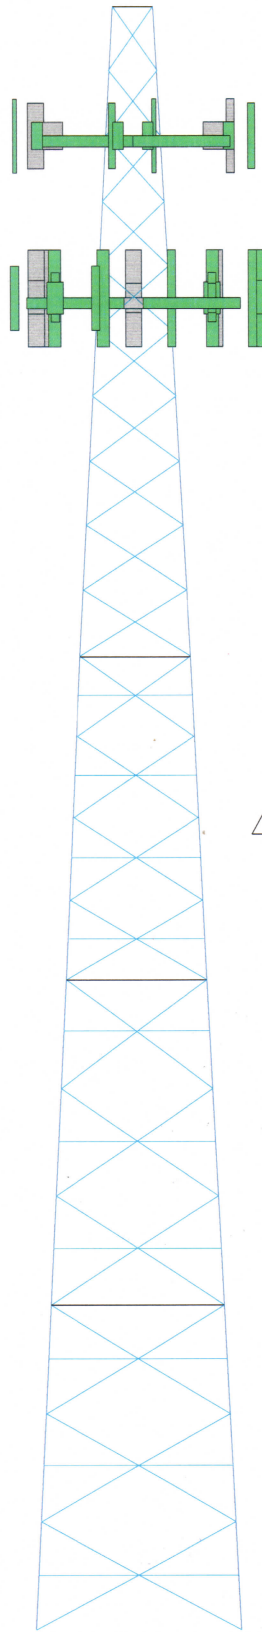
Photo illustrating the Tower with Appurtenances shown.
